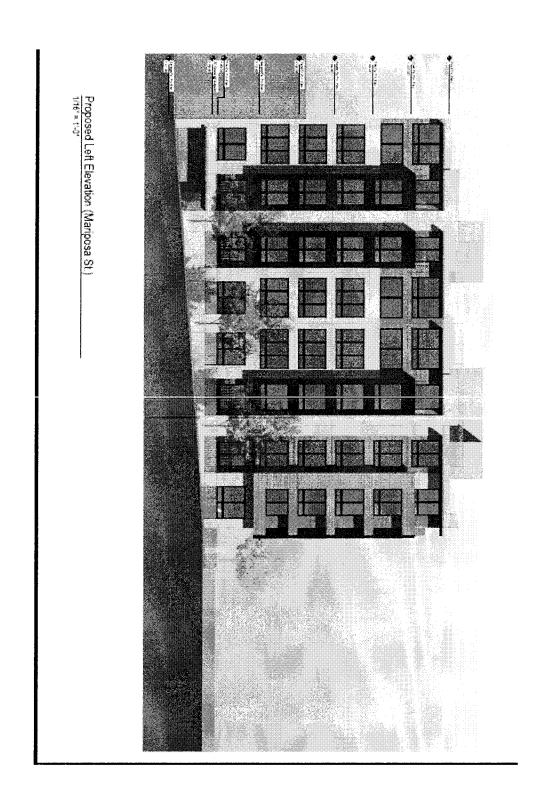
South Elevation (Mariposa Street) 480 Potrero Avenue
